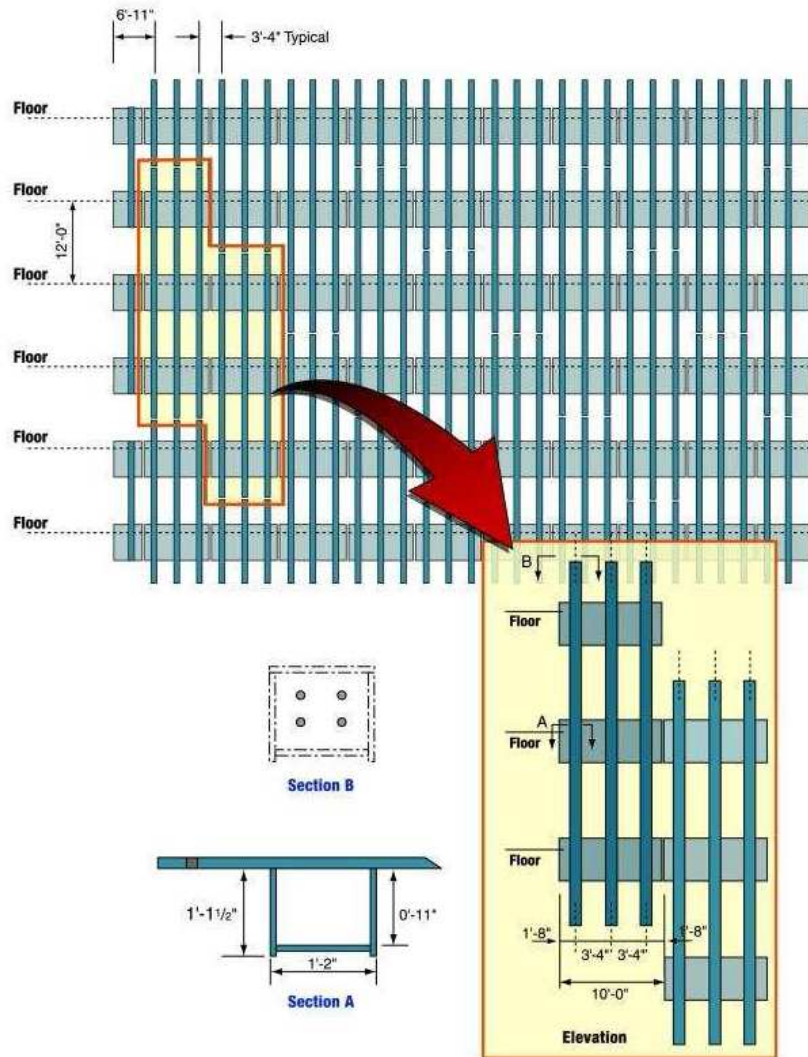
Presents a partial elevation of this exterior wall at typical building floors. FEMA report 2000
